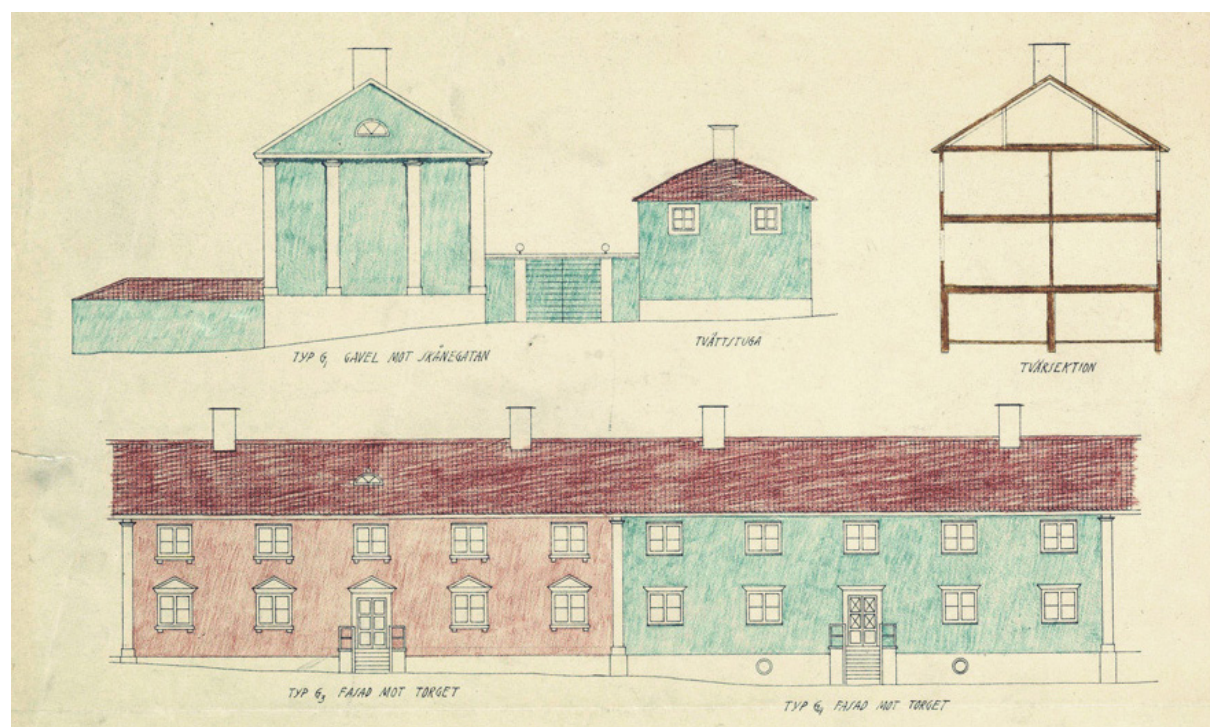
Stativet and Tumstocken in Stockholm, Gunnar Asplund. Floor plans and elevations, 1:400.
